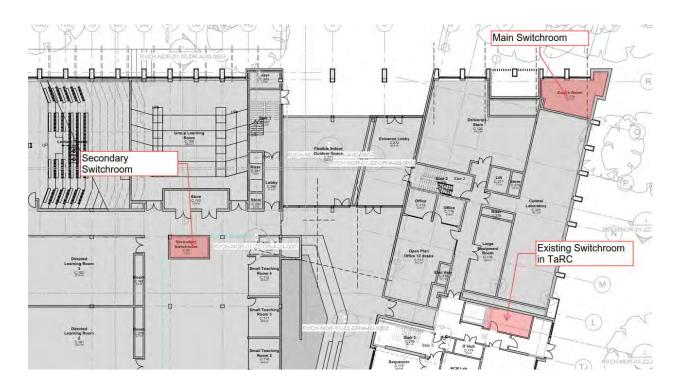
Ground floor layout showing existing and proposed electrical switch rooms
